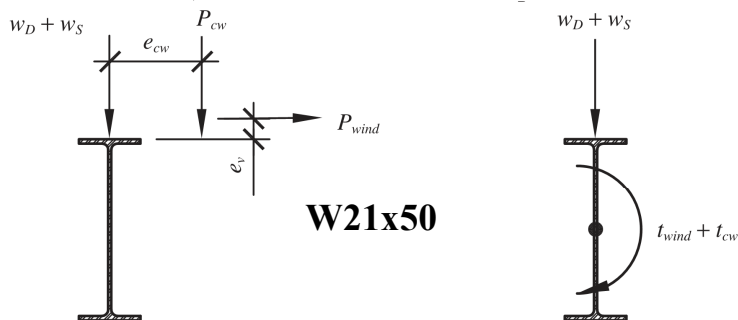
Vertical and torsional loads on spandrel beam.
